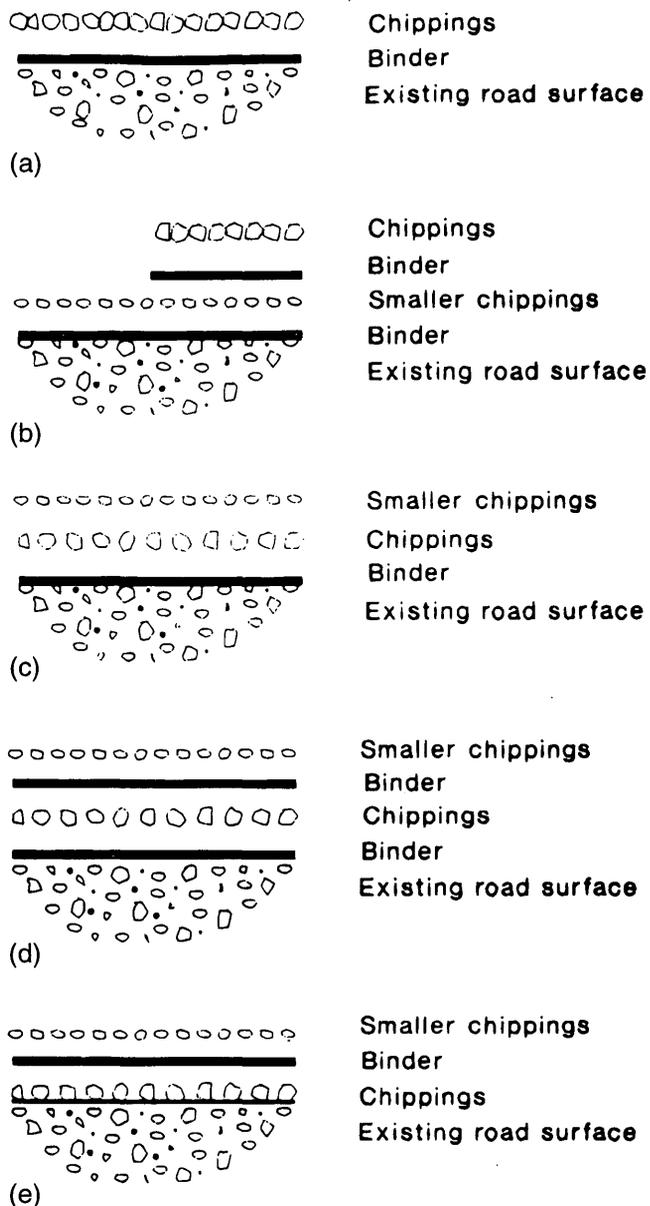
Types of surface dressing: (a) single dressing, (b) pad coat plus single dressing, (c) racked-in dressing, (d) double dressing, (e) sandwich dressing.
